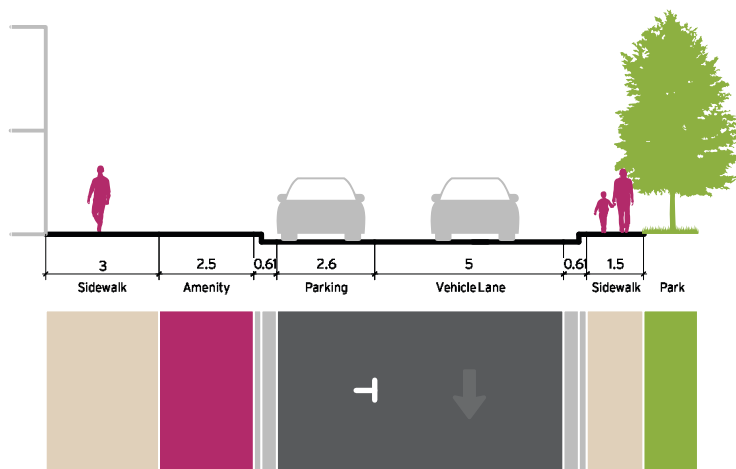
| MIRAMICHI DOWNTOWNS MASTER CIRCULATION PLAN - NEWCASTLE
